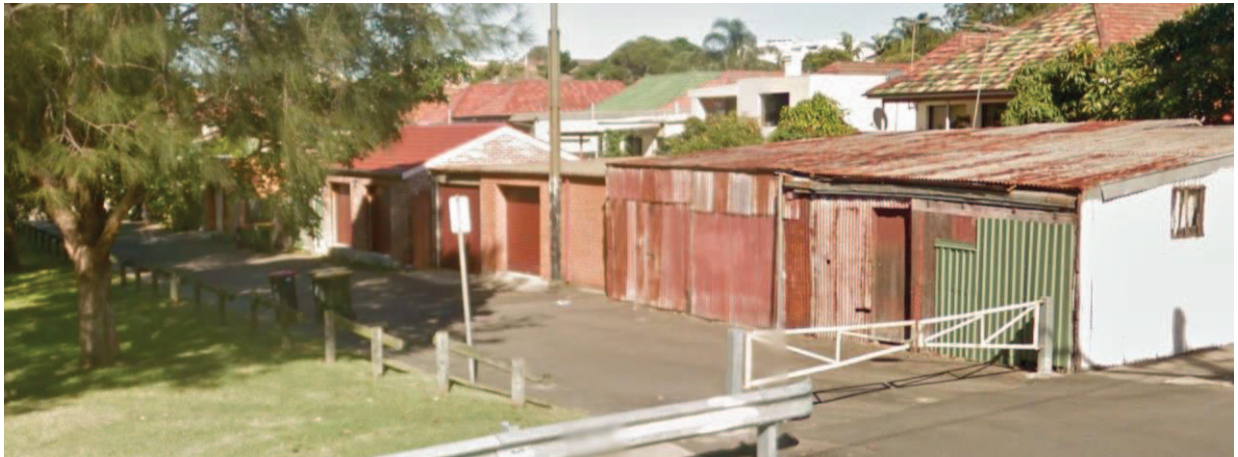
Herb Greedy Place. Proposed replacement of gate with bollards and bicycle roadmarkings in the lane.
